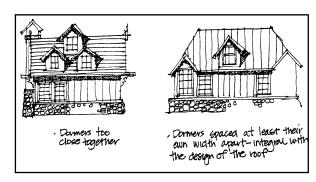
ROOF ARCHITECTURAL FEATURES
